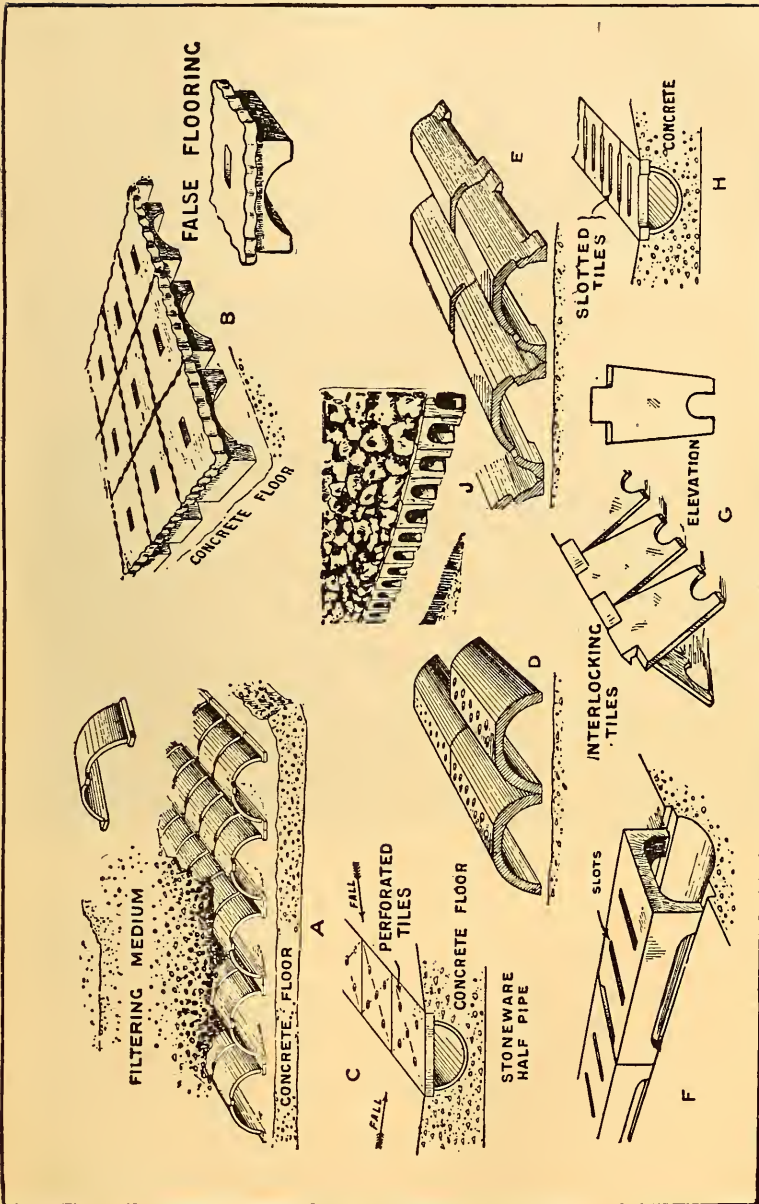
Types of Underdrains for Trickling Beds (copied by permission from *Sewage Disposal Works* by H. P. Raikes, Constable Co., London).
